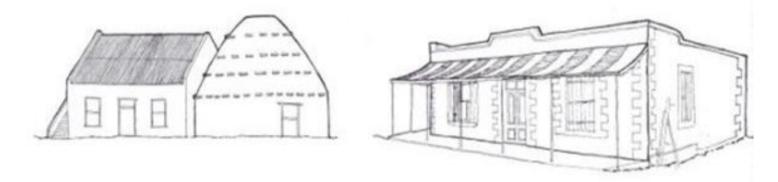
Corbelled house with pitched roof editions, and 1880s Karoo dwelling with concave corrugated sheeting roof
